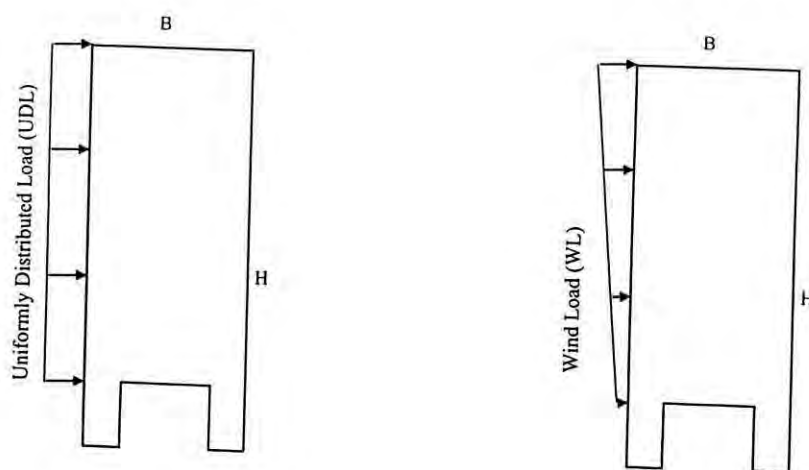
Two Types of Lateral Load Applied in Double Legged Plane Shear Wall.
